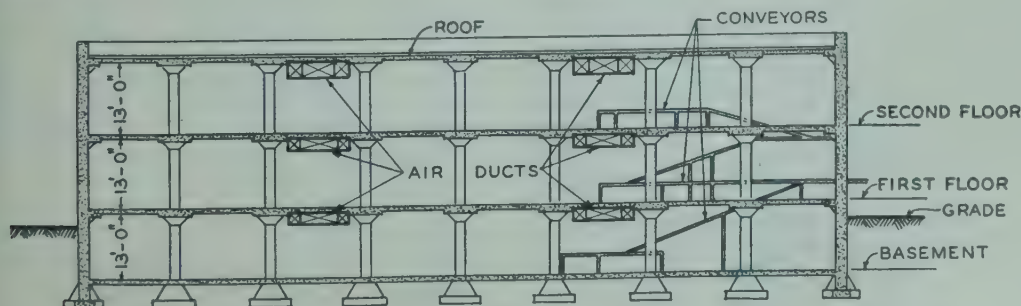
Cross Section Typical Well Constructed Lemon or Grapefruit Storage Plant, Adjacent to Packing House.
